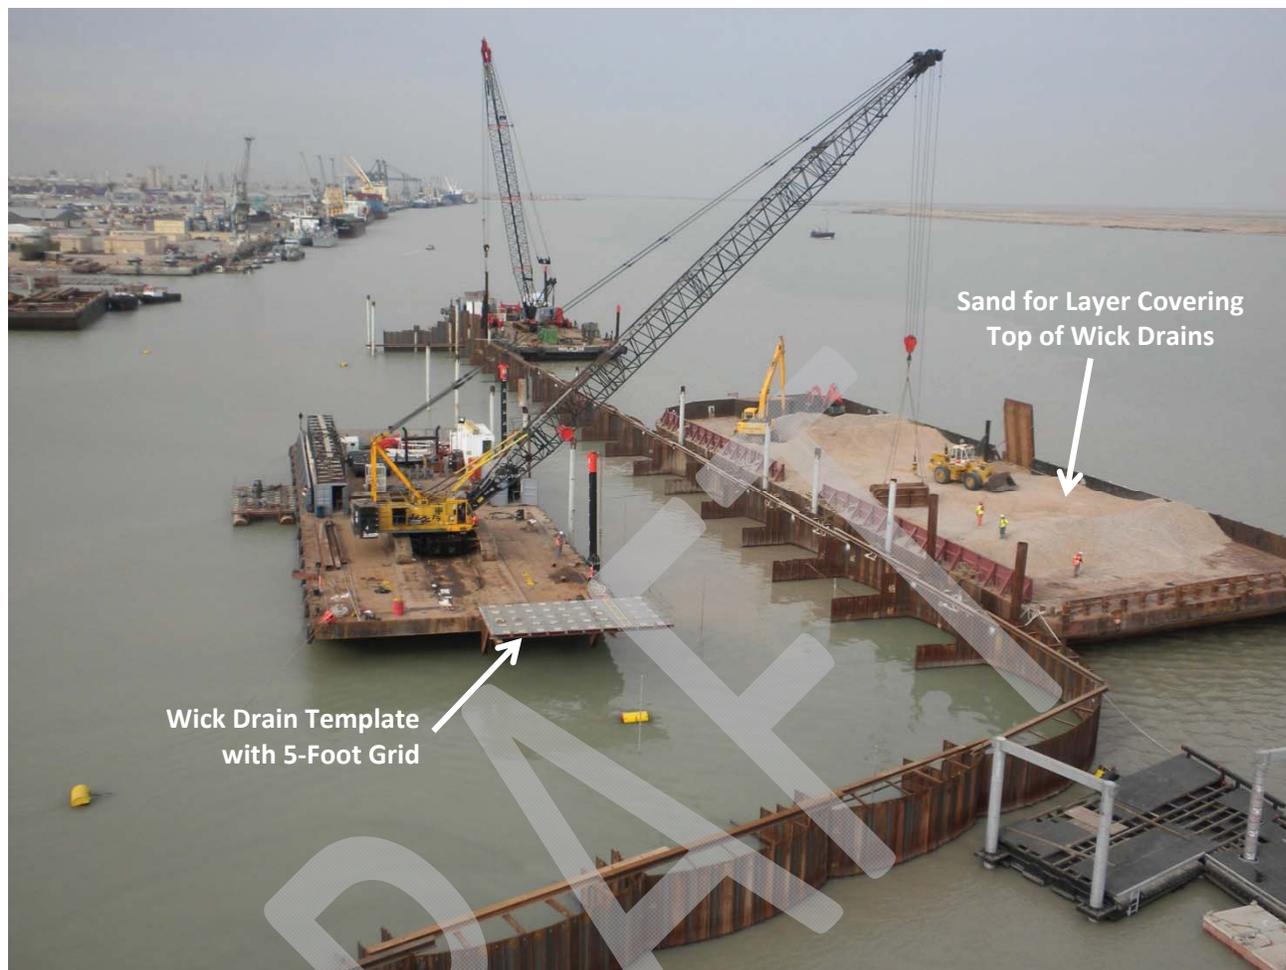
Umm Qasr Bulkhead Construction - Sand Layer Placement and Wick Drain Template
